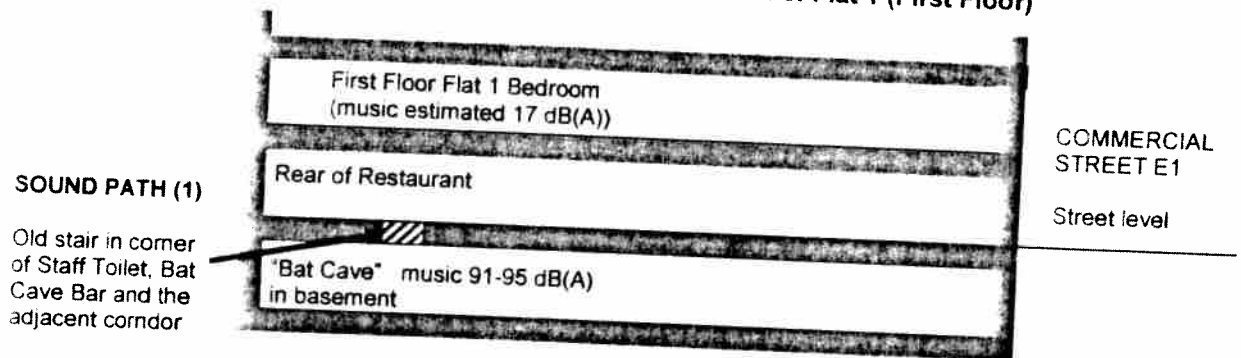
Illustrative Section through Building Edge (basement), Restaurant (ground floor), and Flat No. 1 (first floor)
